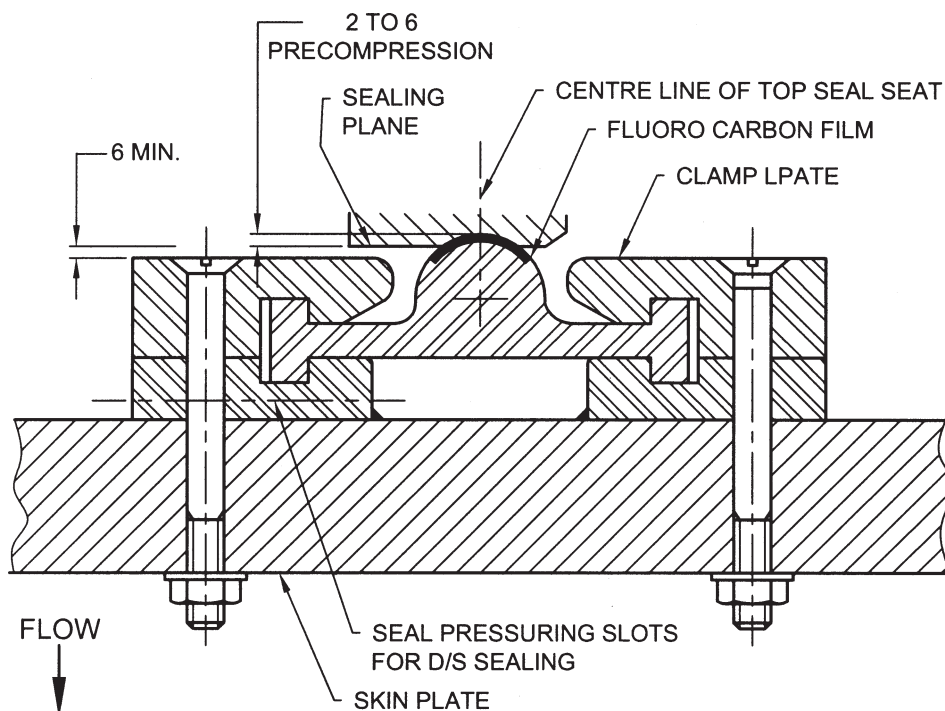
A ASSEMBLY DETAILS WITH DOUBLE STEM SEAL (UPSTREAM SEALING)
